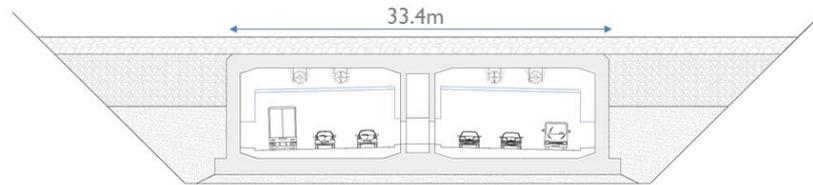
INDICATIVE DUAL 3 LANE IMMERSSED TUNNEL CROSS SECTION
